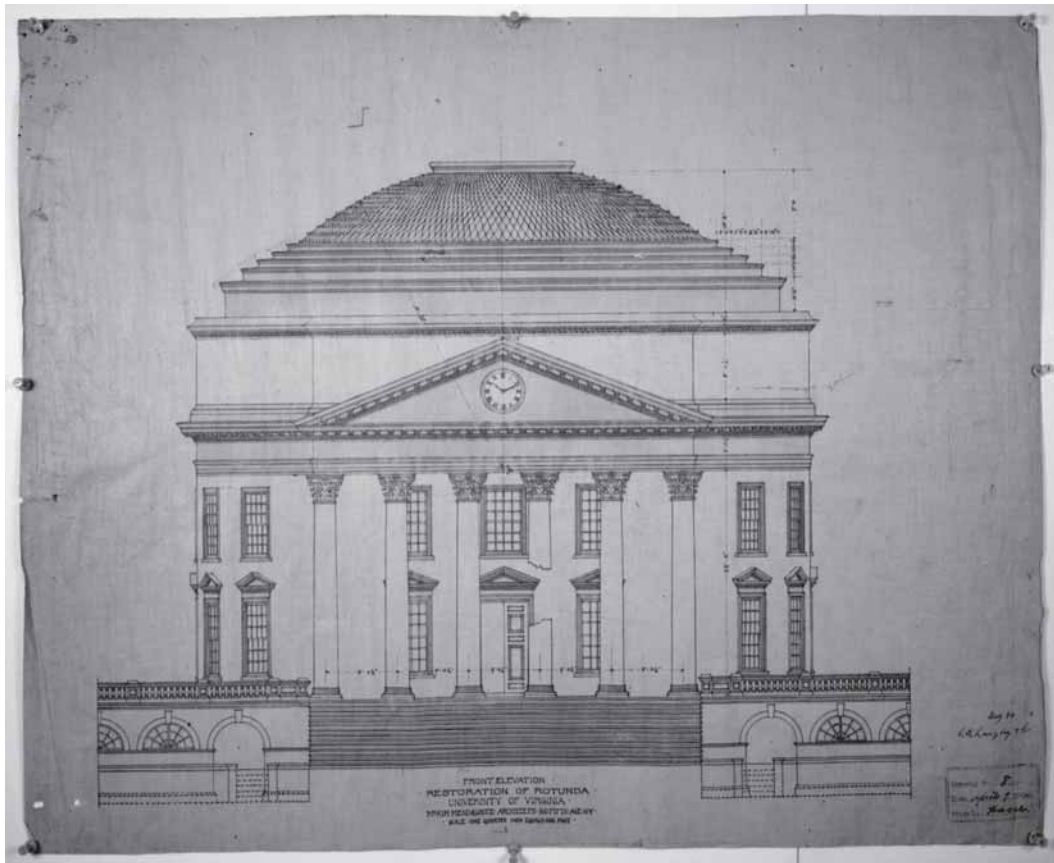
McKim Mead & White drawing of the south elevation. [Special Collections, UVA]
